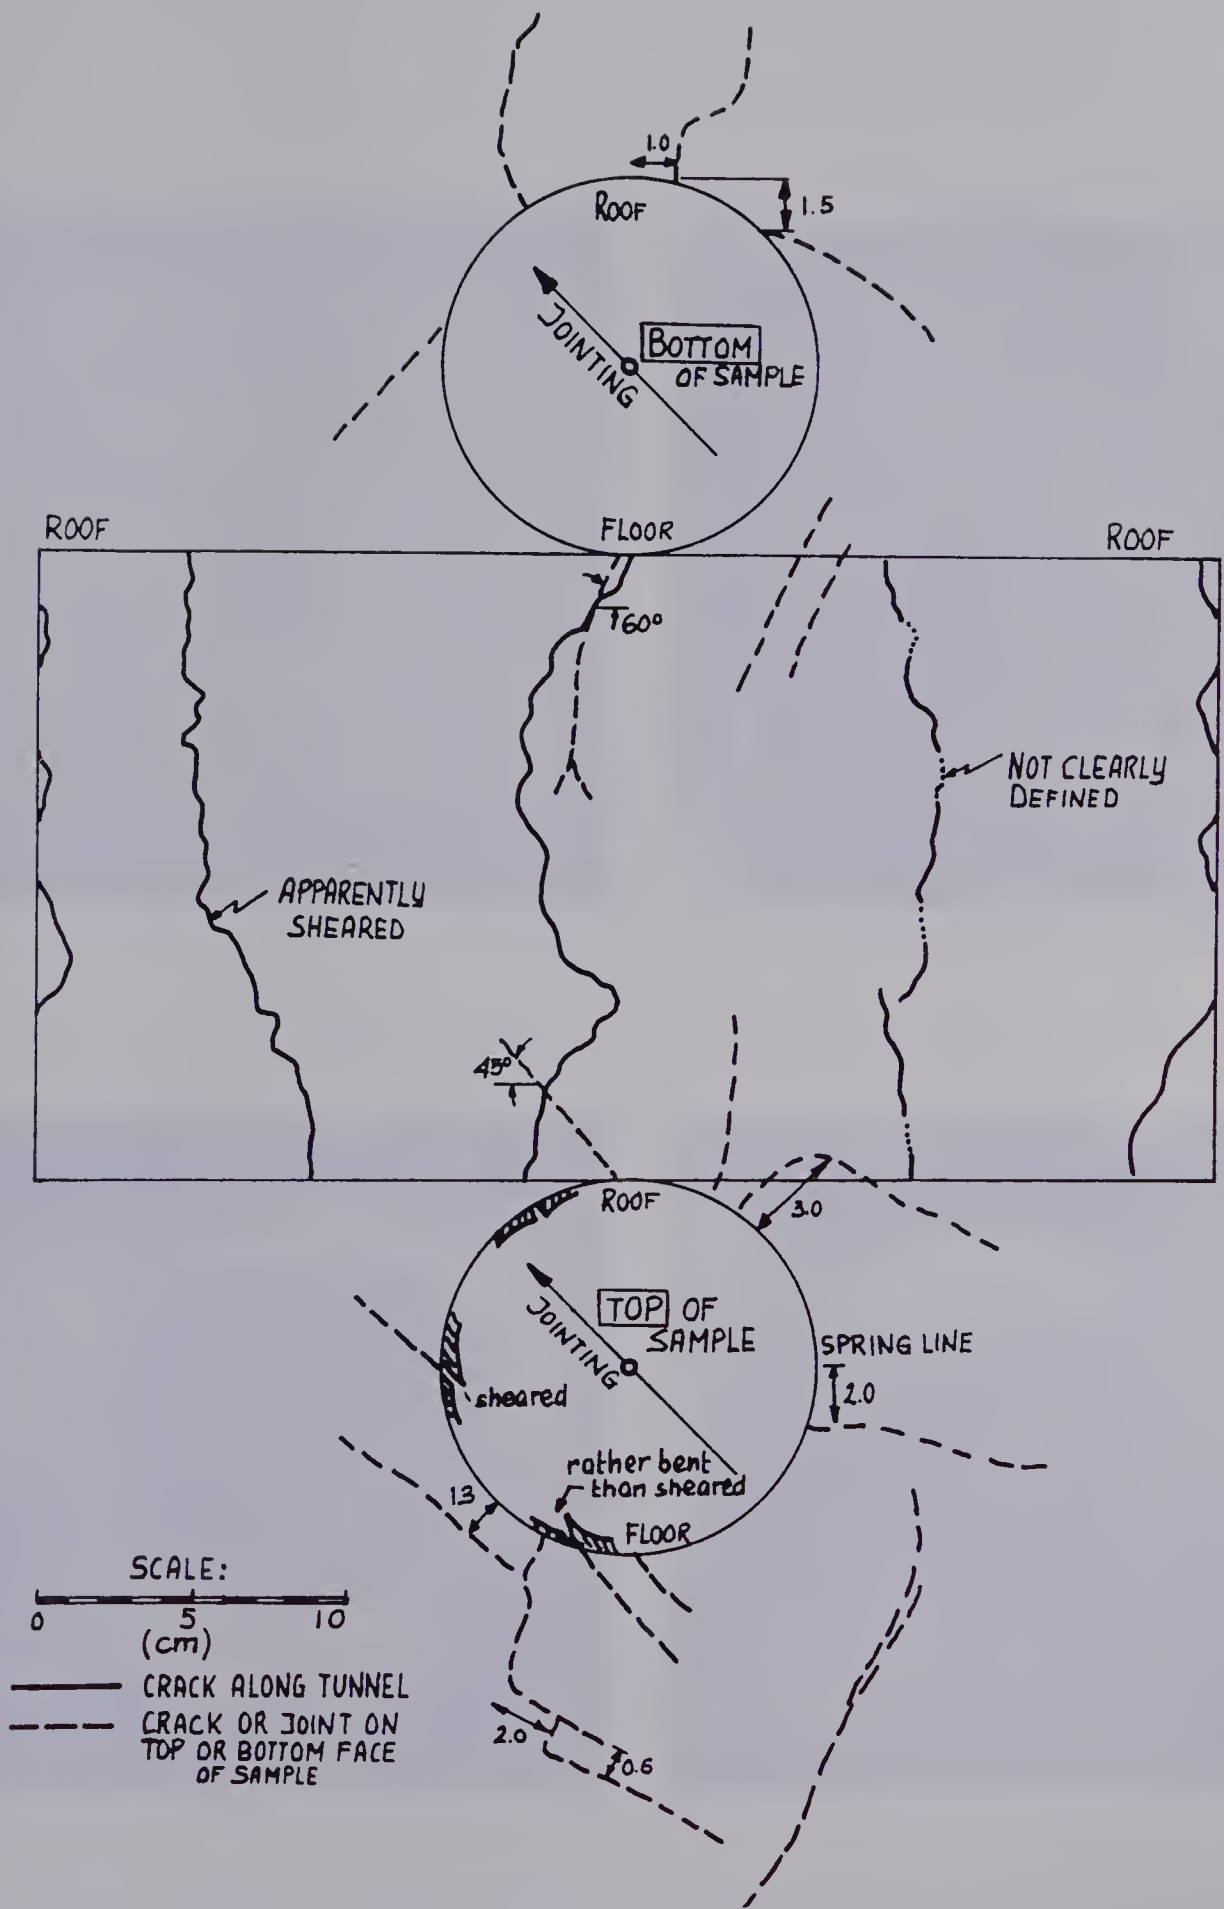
Crack Pattern Inside or Near Tunnel after Unloading during Test MC-2.9
